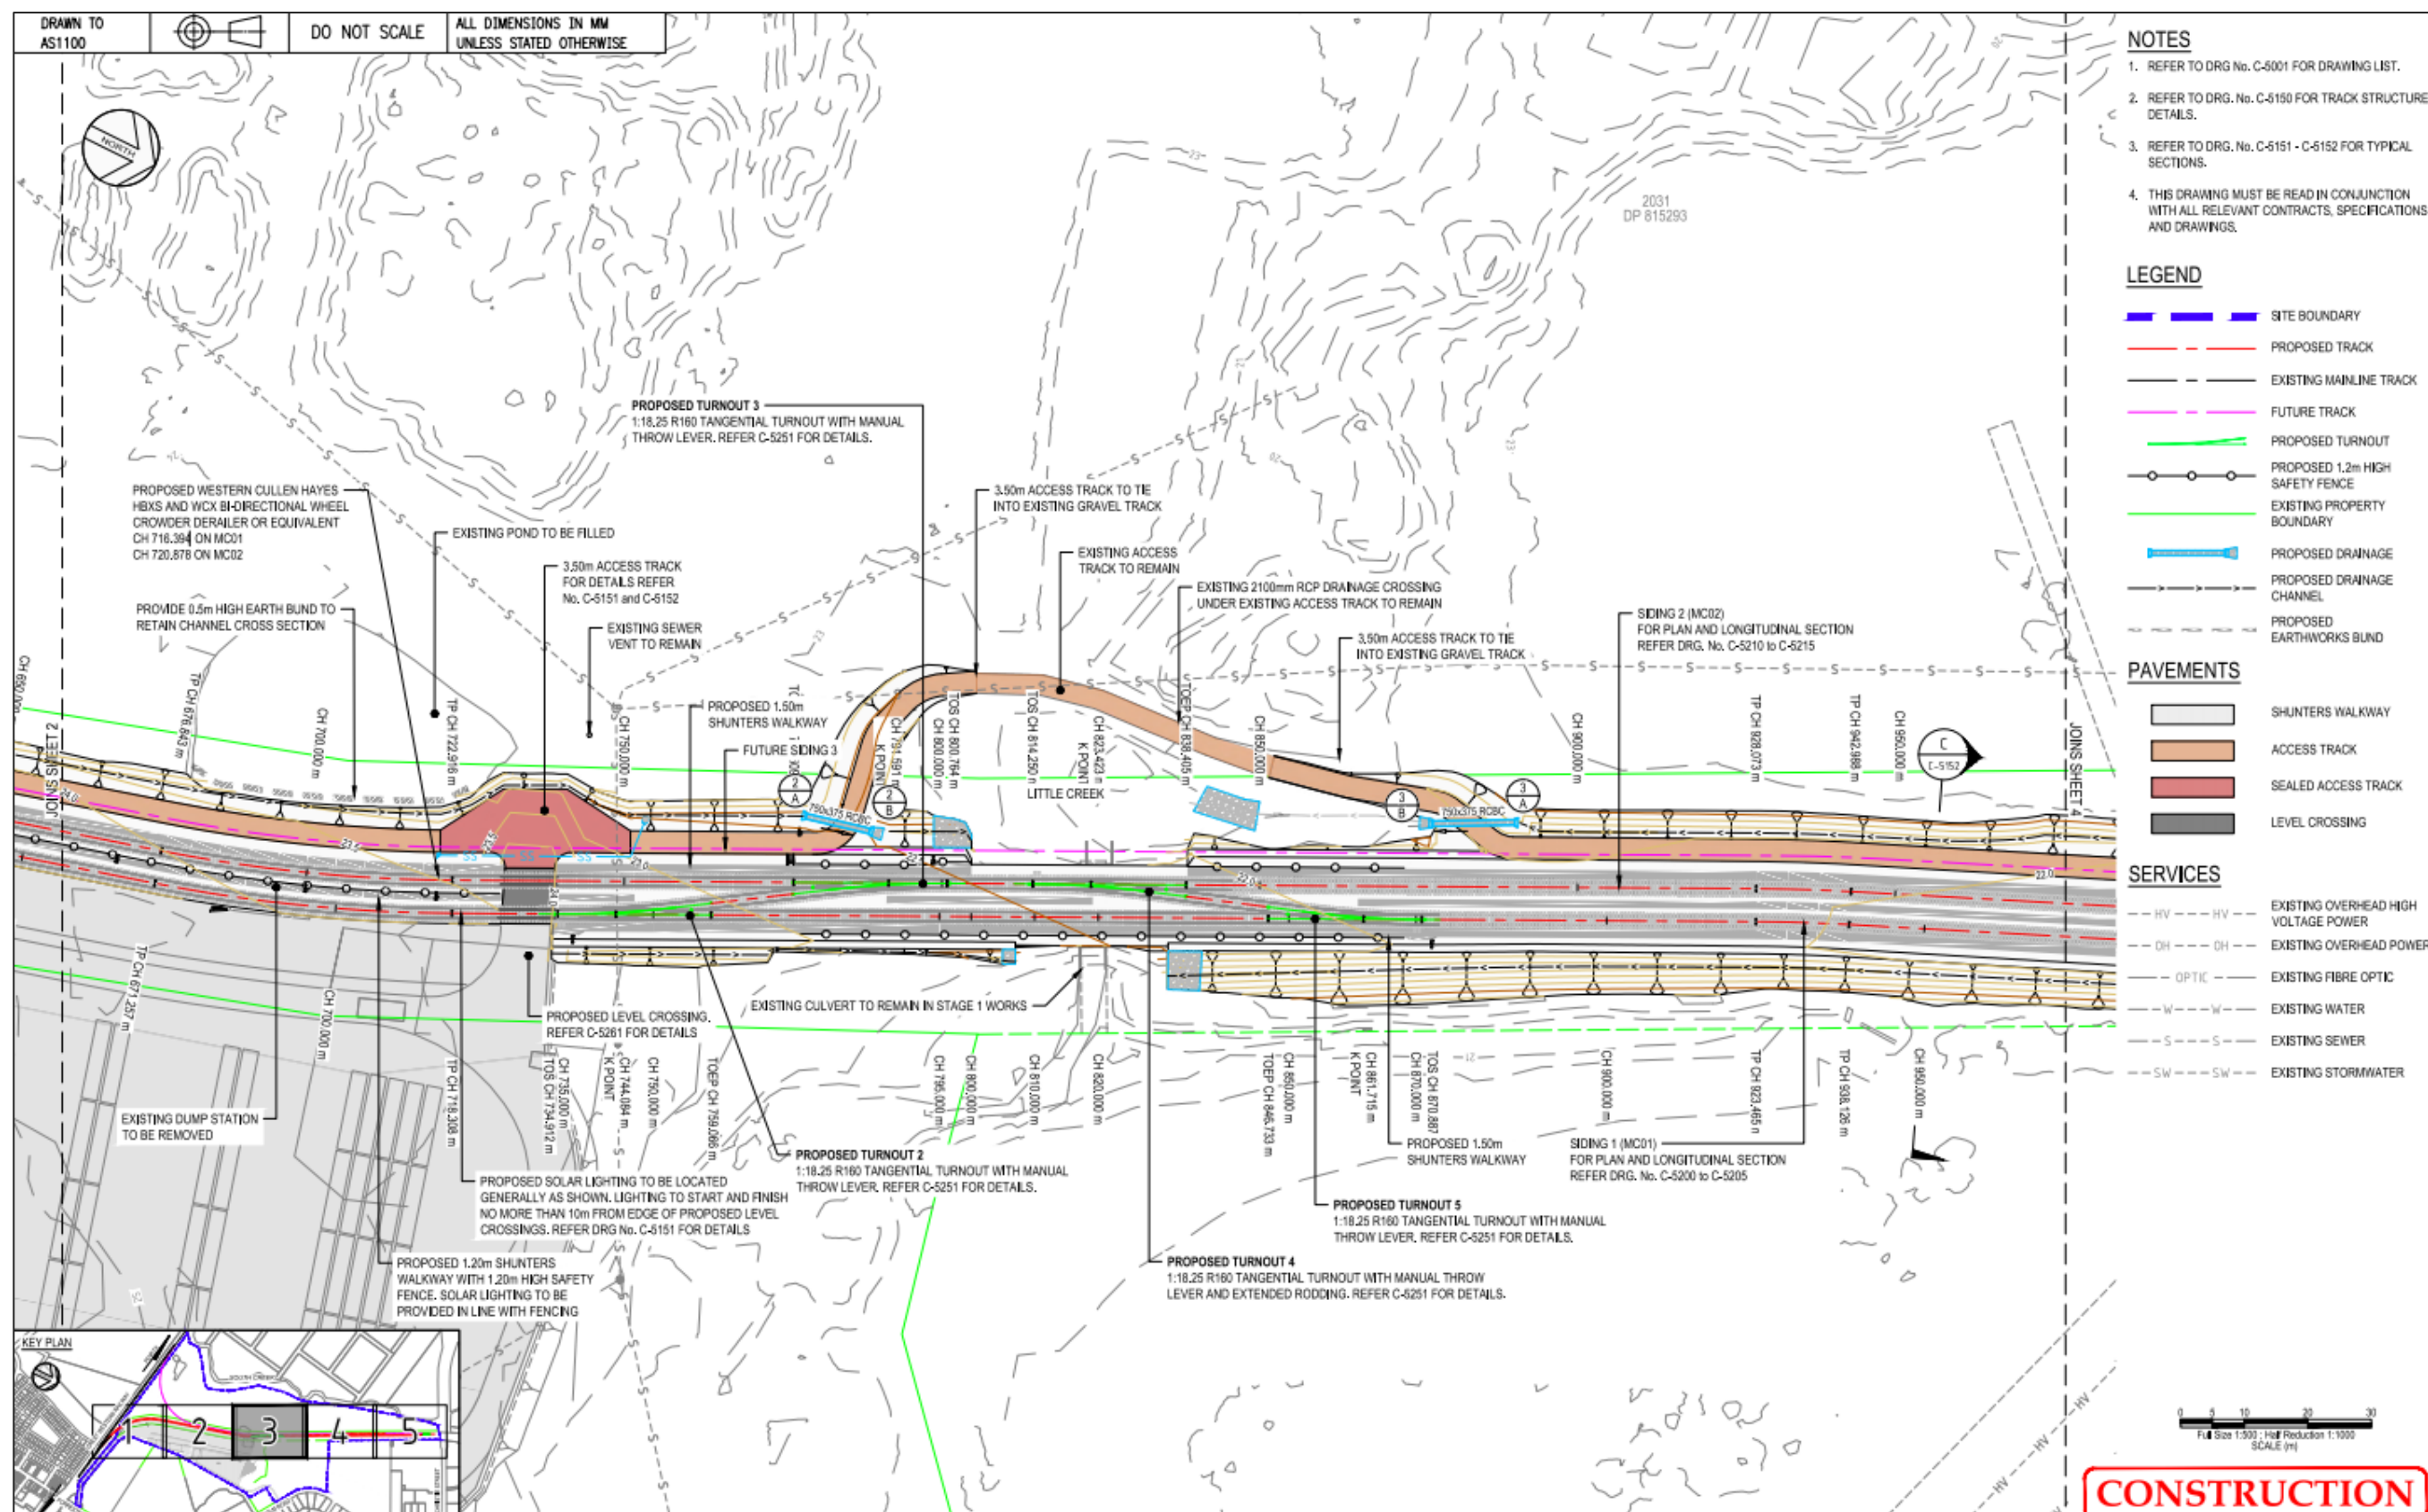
| Rail refurbishment works engineering drawings – Sheet 02 of 05 (Source: Applicant's Modification Report)
